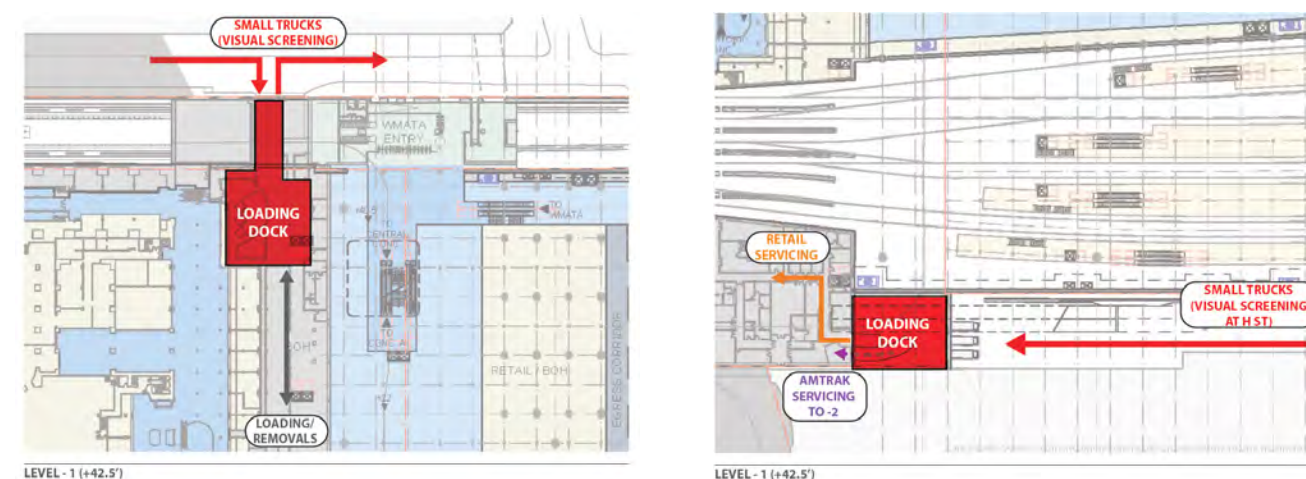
EXISTING EAST AND WEST LOADING DOCKS
